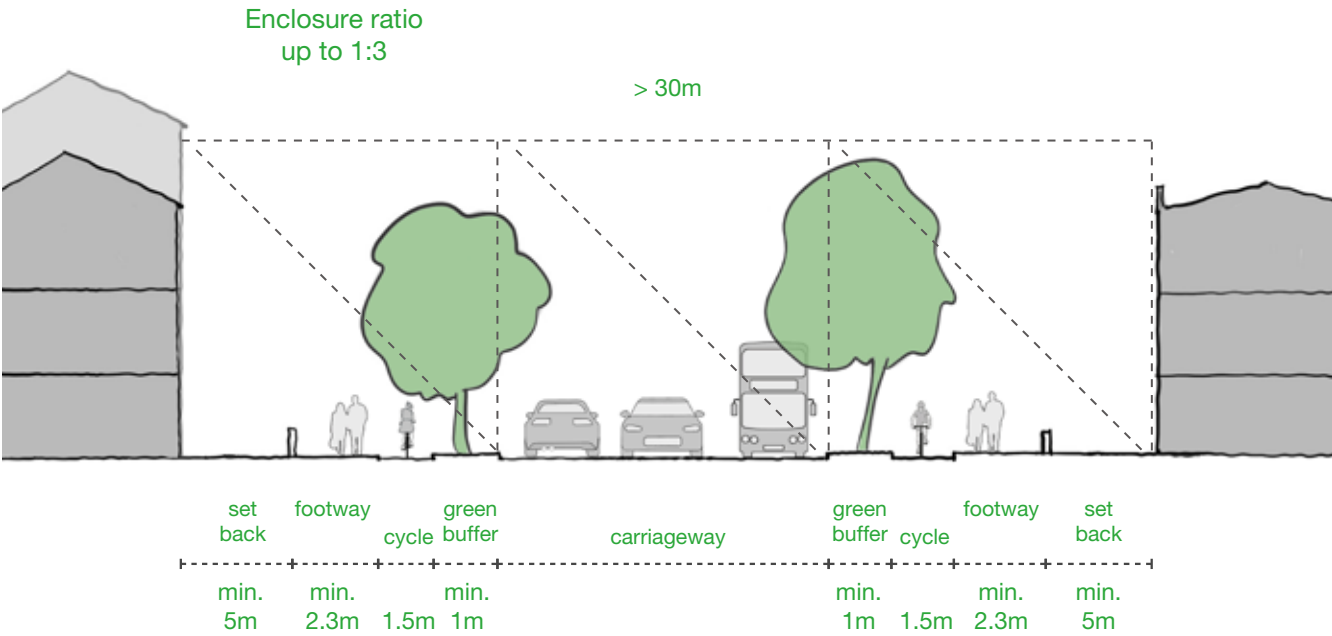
Typical street section of primary traffic street in Lichfield City Centre area
